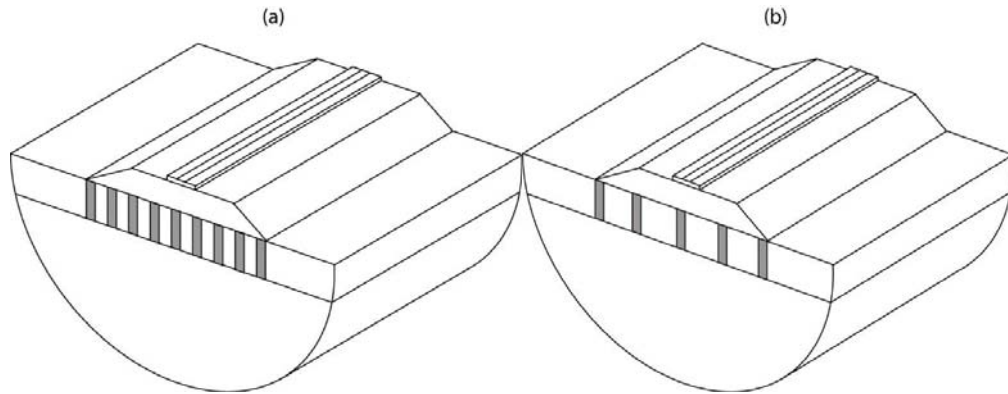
Discrete soil stiffening model (a) stone column, (b) jet grouting
